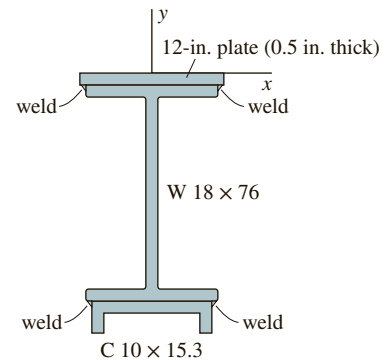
Steel beam built up from a wide flange section, a channel and a plate.
